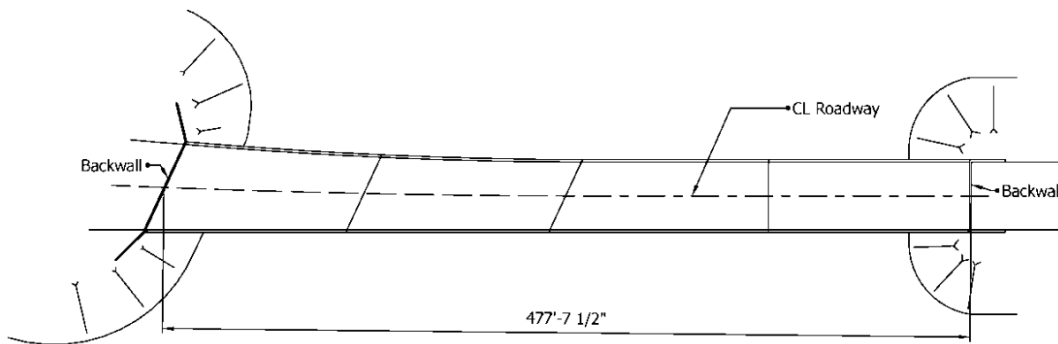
Plan view of a four-span bridge with variable skews (Example 1)
